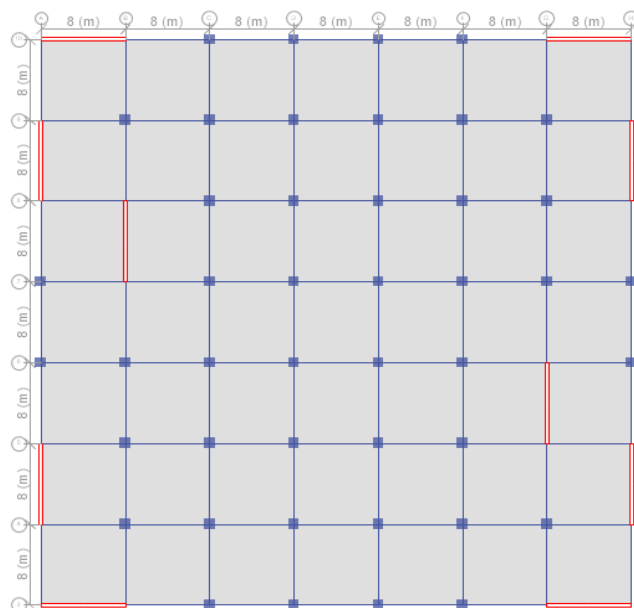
Model 1: Shear wall without any openings: PlanFigure
